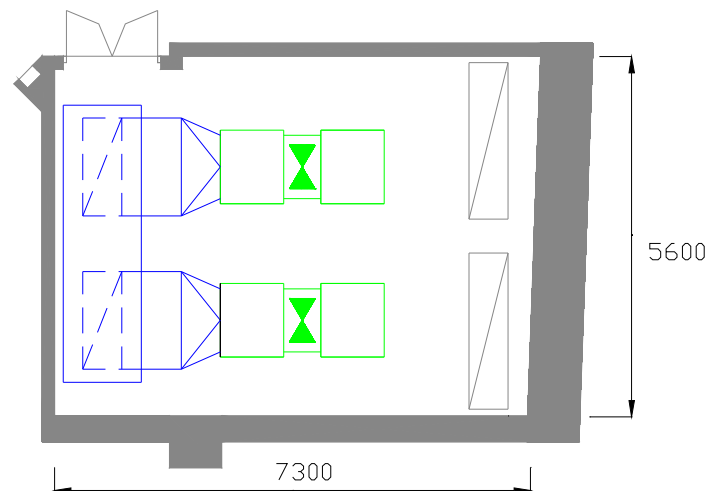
shows the plan elevation of the plant room layout and the indication of the parameters of the room. The number of existing components such as plenum box, mechanical ventilation fan, silencers and masonry shaft has also been indicated in the plan elevation.
